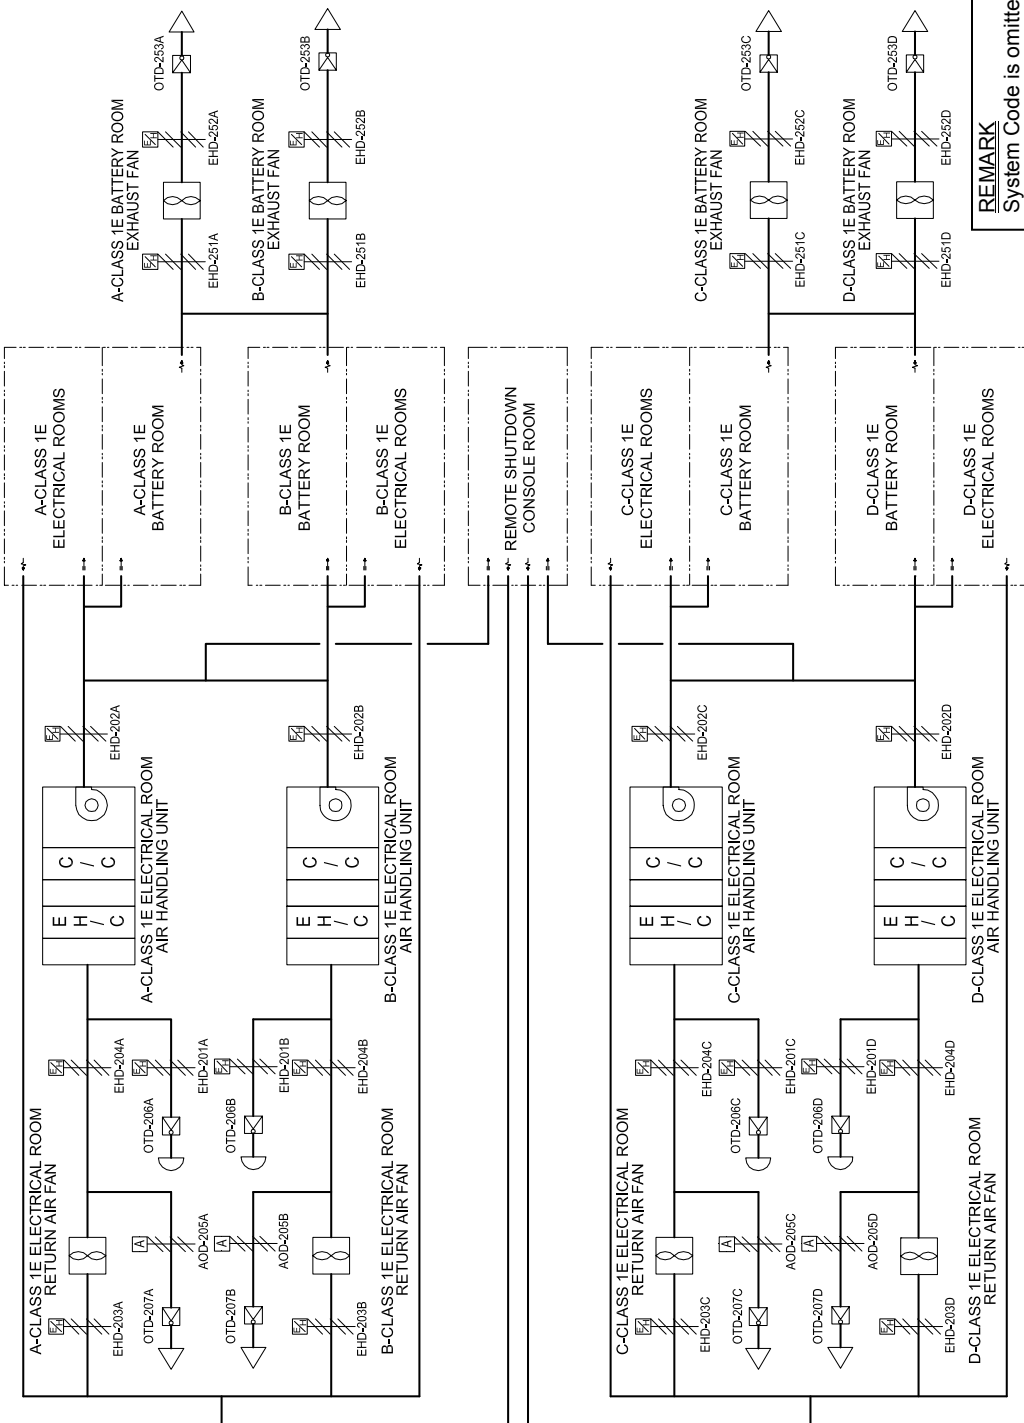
Class 1E Electrical Room HVAC System
